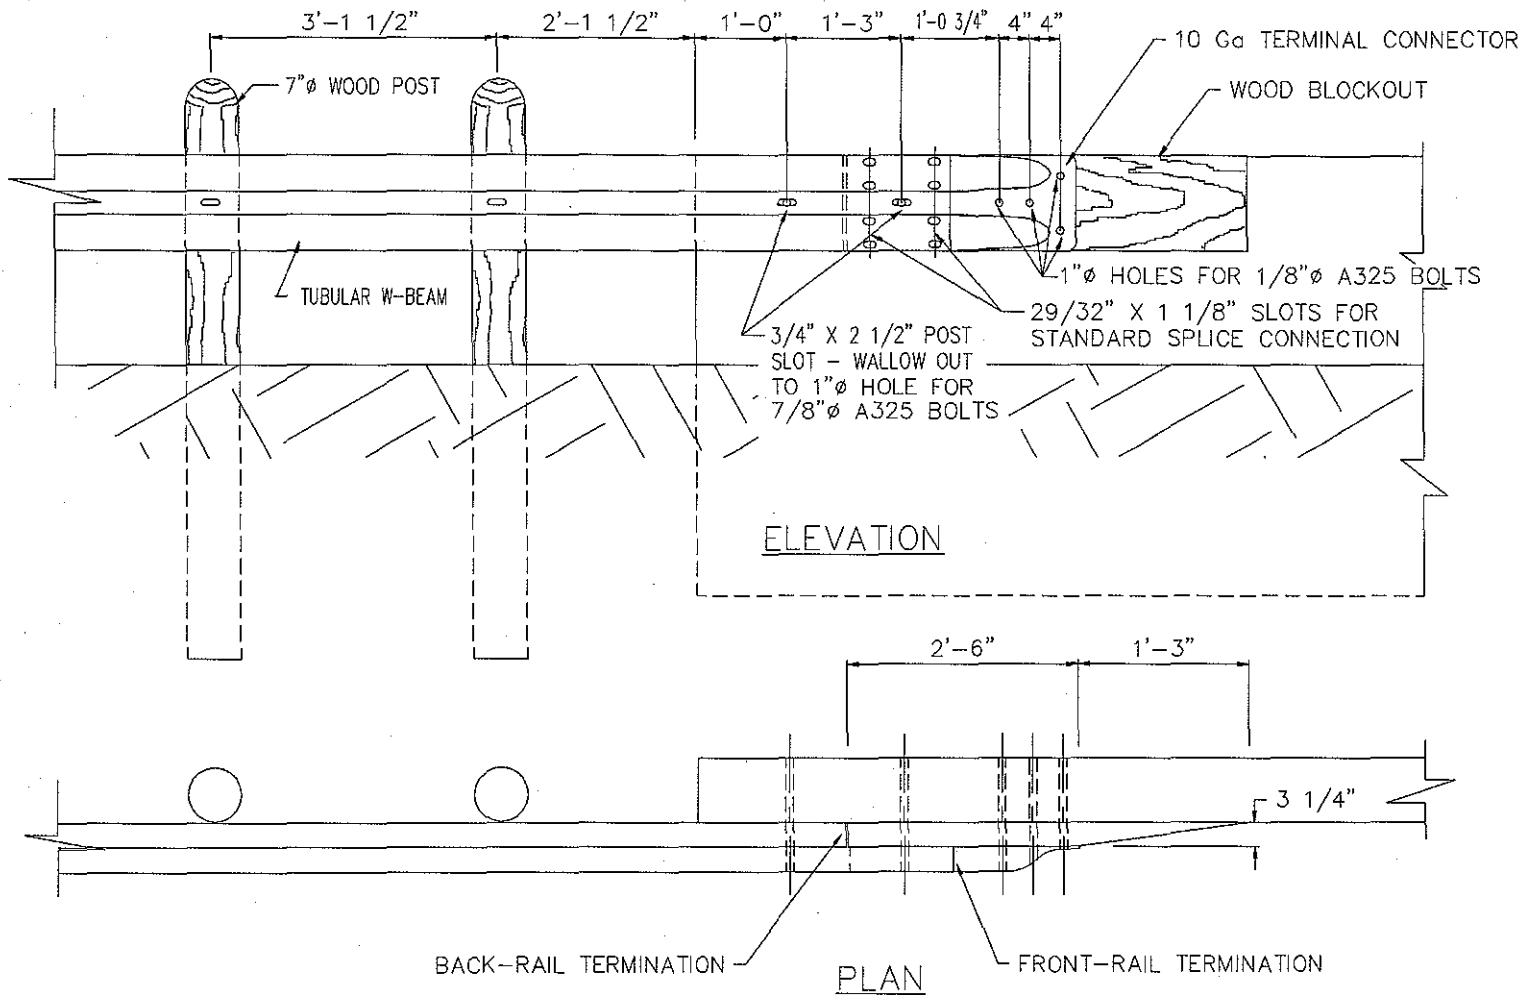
TERMINAL CONNECTION TO VERTICAL WALL AS USED IN TESTED INSTALLATION
